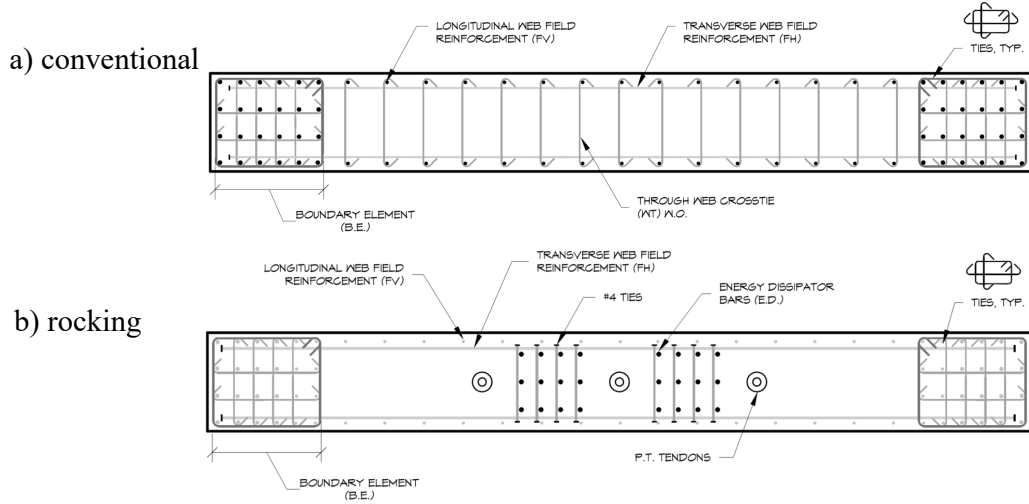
Base-level sections showing reinforcement details of a) conventional walls and b) rocking walls.
